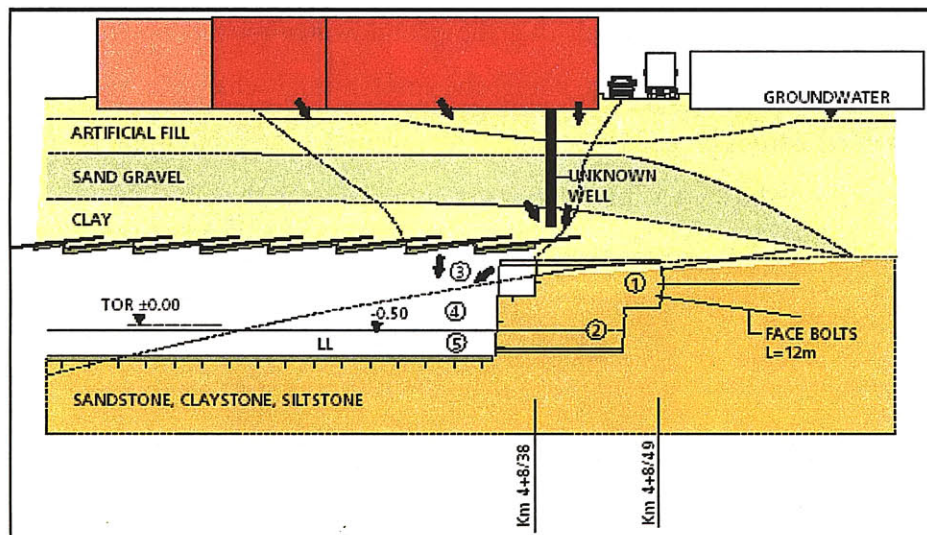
Longitudinal section through the collapse area showing geology and position of surface structures, Istanbul metro (Ayaydin, 2001)
